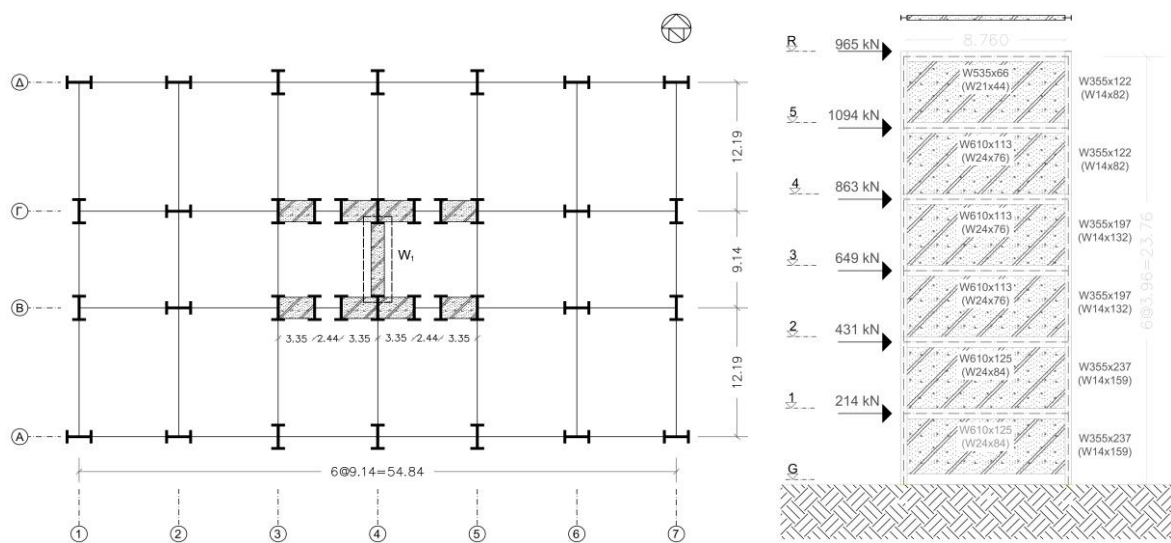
Building plan and considered infilled frame W1 (units: kN and m)
